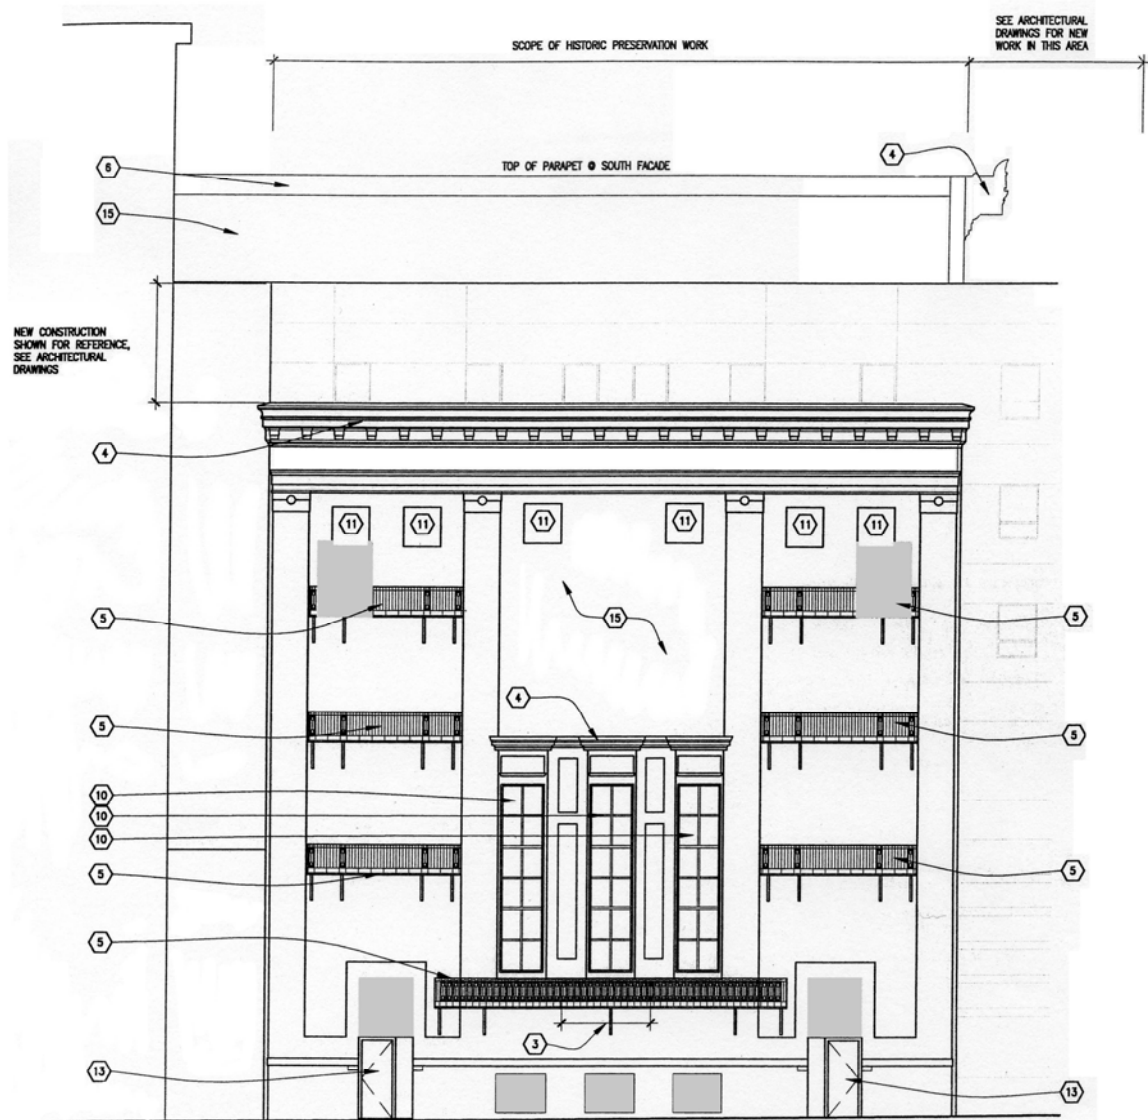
North (back) elevation of 50 Oak Street (NTS).
